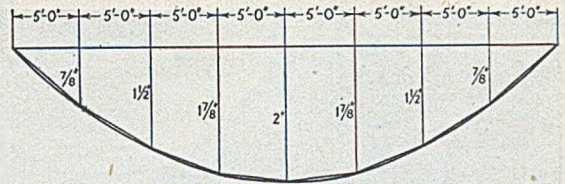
Illustrating the Negligible Error caused by using Straight Strickles in Setting Chamber.
